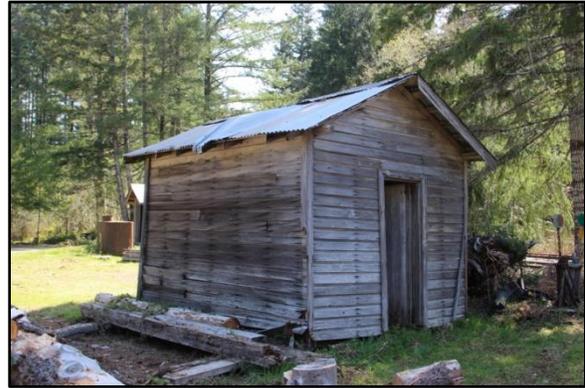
& 147 – (left to right) structural deterioration of the planks and timbers
